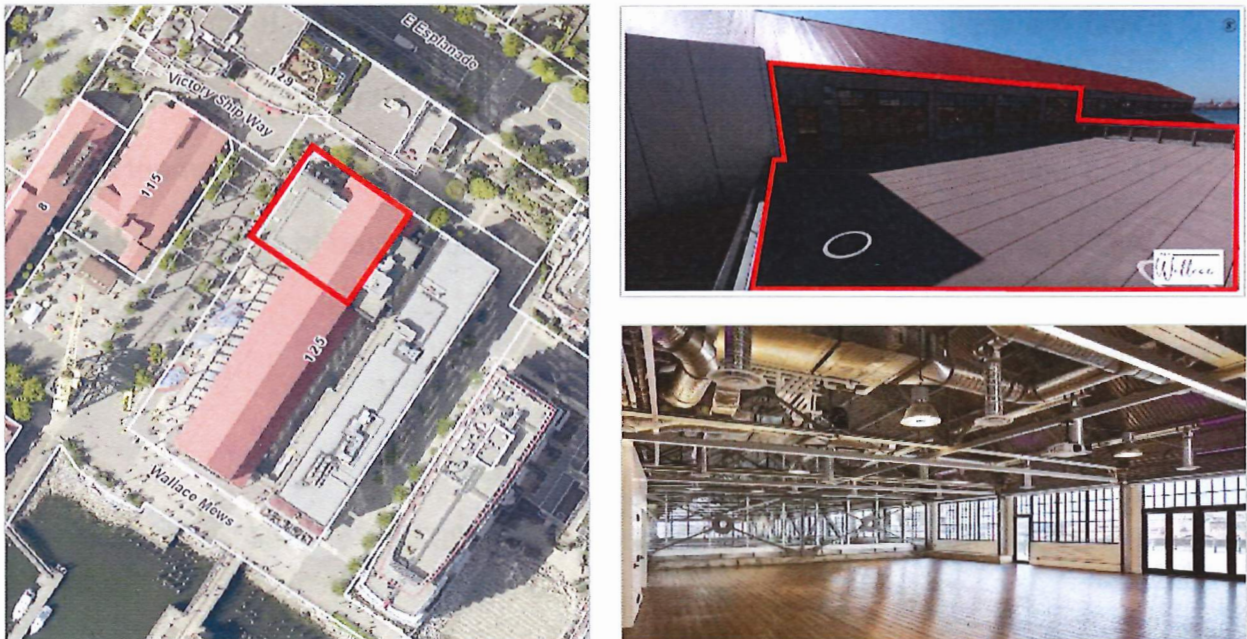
(Left) Site plan depicting subject unit location at third floor; (Right-Top) Photo of exterior terrace; (Right-Bottom) Photo of interior unit space.
